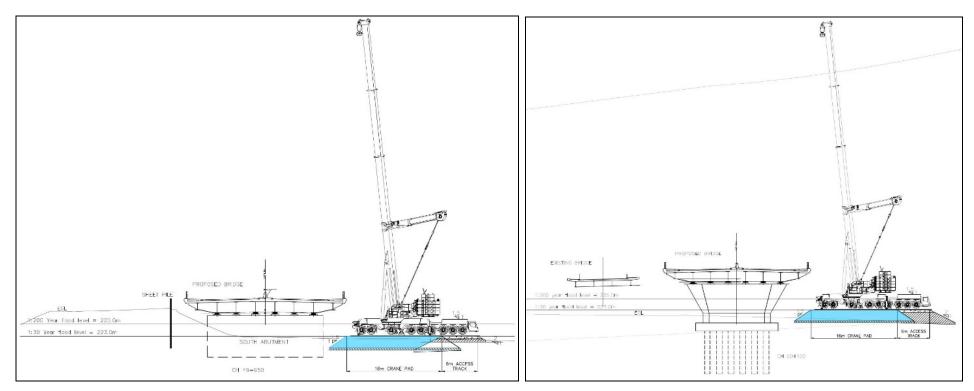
Cross sections showing existing embankment and bridge, new bridge position with crane pads temporarily raised above 1:30 flood level
